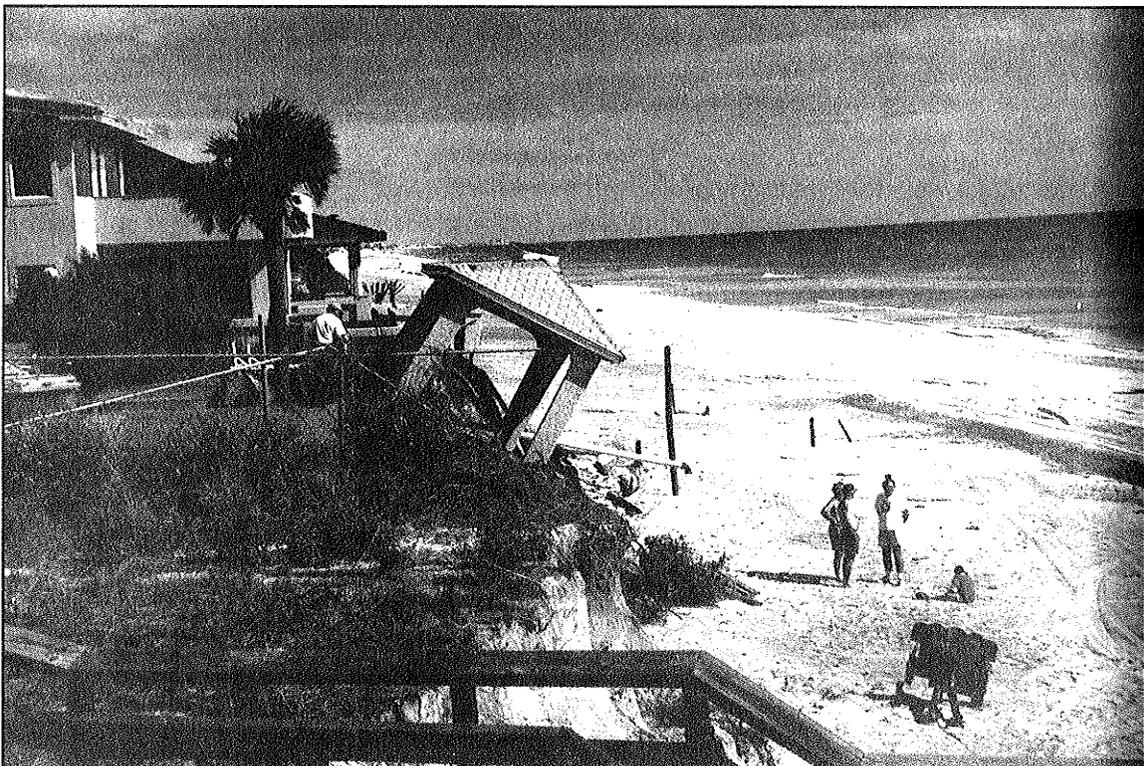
Erosion such as this took place along the gulf coast, causing structures to be undermined and resulting in damage.
